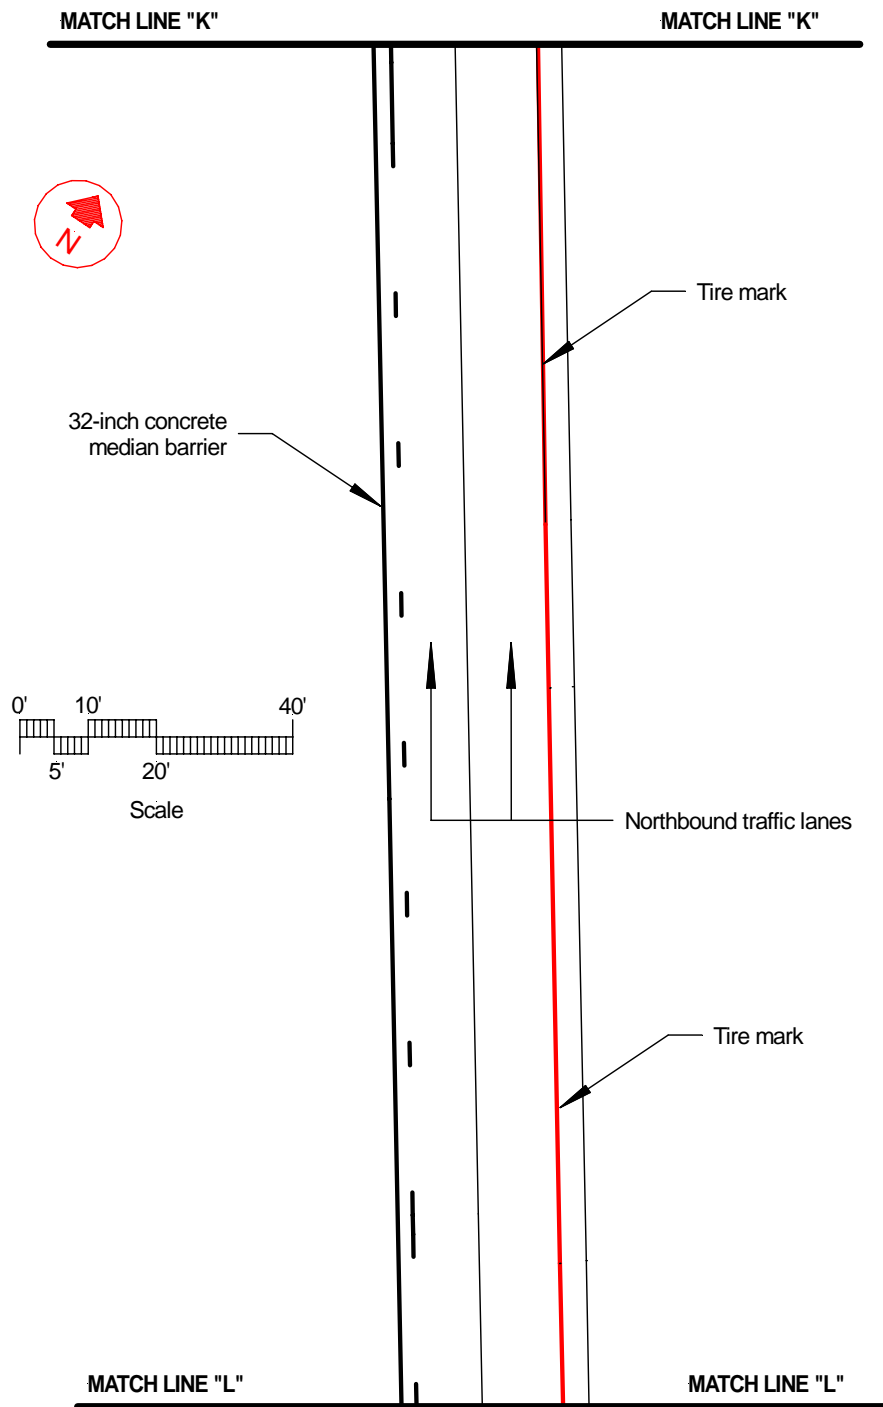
NTSB map of K-L pavement markings and roadway evidence.
